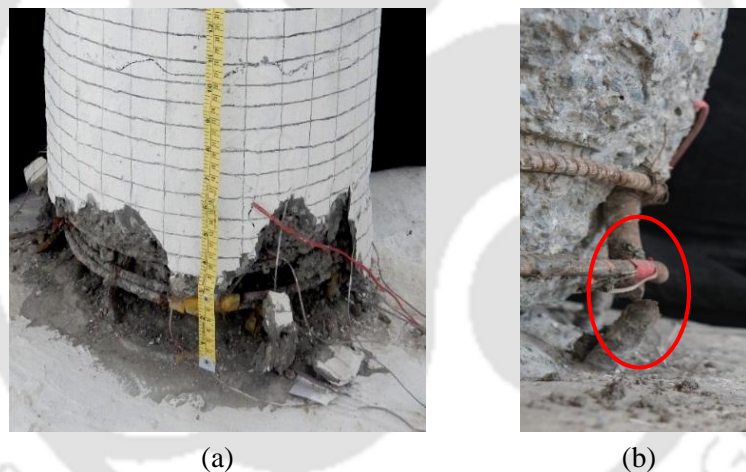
Damaged specimen showing (a) crushing of core concrete and buckling of longitudinal reinforcement (b) fractured rebar (Kotoky *et al.* 2018)
